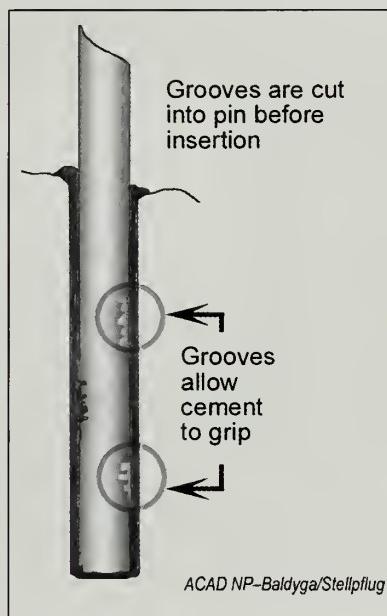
Detail of iron attachment using chemical adhesive or hydraulic cement.
